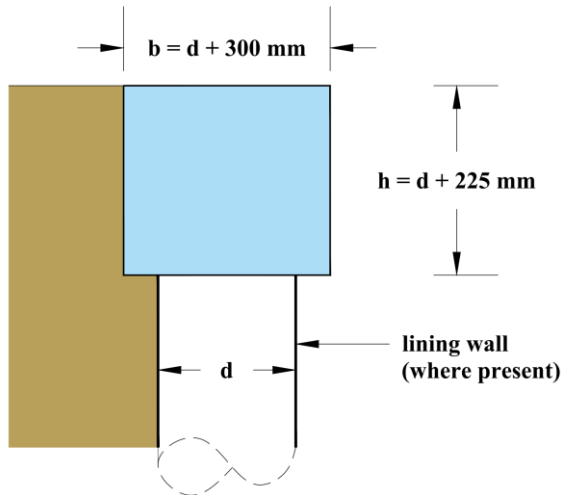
Cap Beam (CB) typical design (Wells, 2009)
